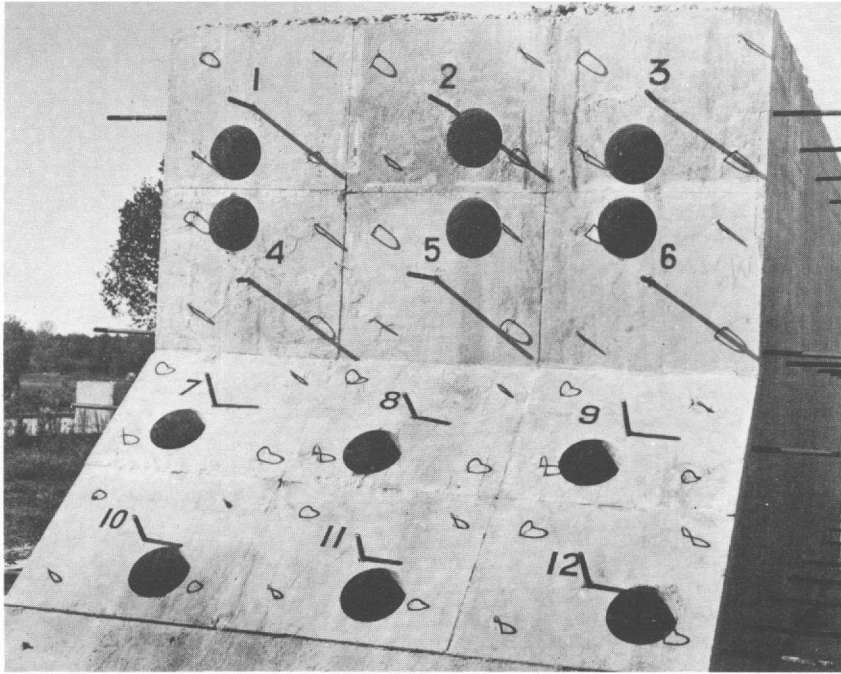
Back face of Prepakt block after extraction of 10-in. cores through the precast slabs.
